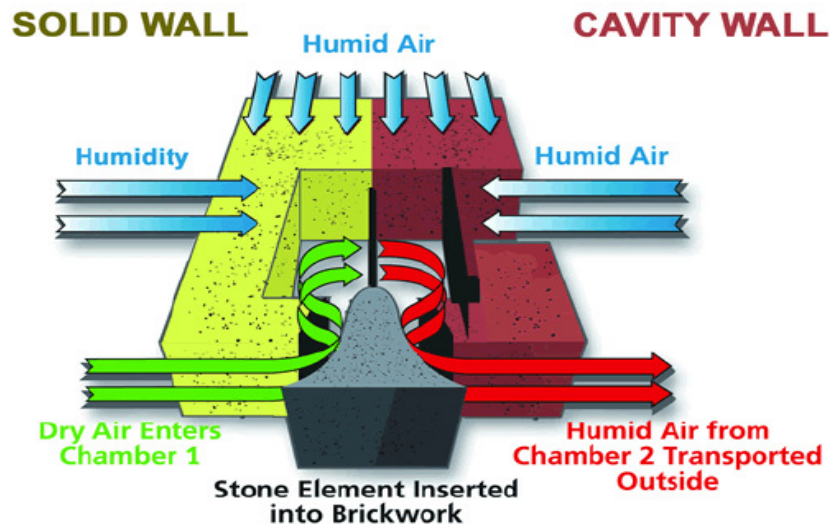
Simplified airflow patterns of the Holland damp proofing system [59]
